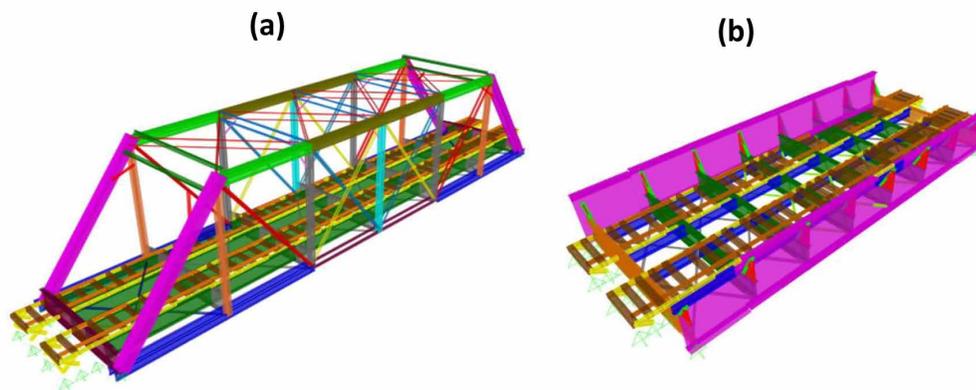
SAP2000 isometric view: (a) truss span; and (b) plate girder span
